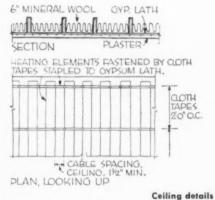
illustrates typical methods of installing cables in ceiling or floor panels. In ceilings the 1/2 in. diameter heating element is held against gypsum lath by cloth tapes 2 ft on centers. Staples through the tape on each side of the wire hold both tape and wire against the lath. Excess lead length must not be cut off and may be attached to the ceiling like the heating wire and later imbedded in plaster. Leads run through protective covering known as loom to the
